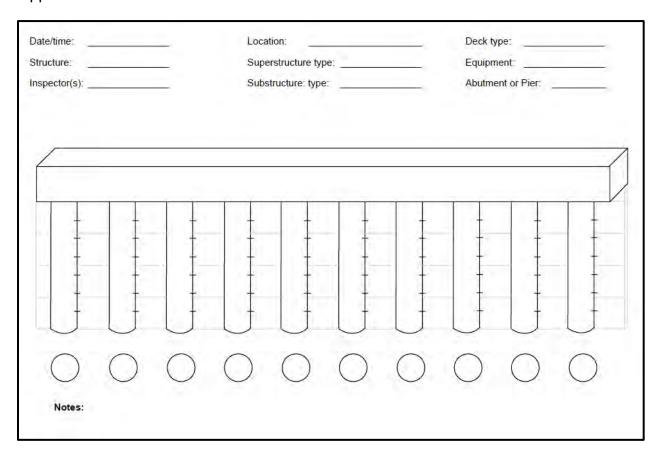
Typical field data acquisition form used for timber abutments, piers, and caps.
